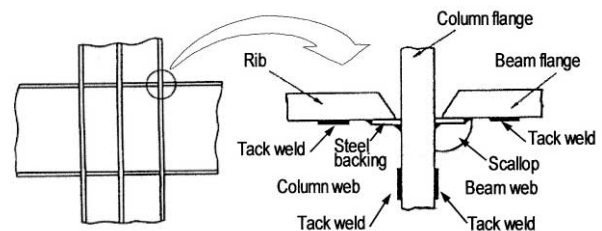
Recommended tack weld locations for a column-to-beam connection joint
